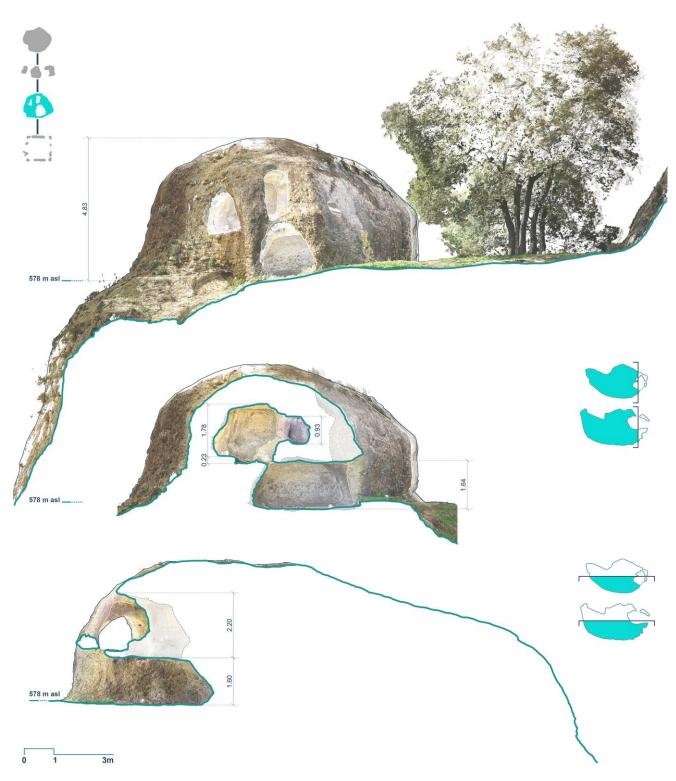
Asceterio, from top to bottom: elevation; cross section; longitudinal section. Drawing by Domenico Mediati.
